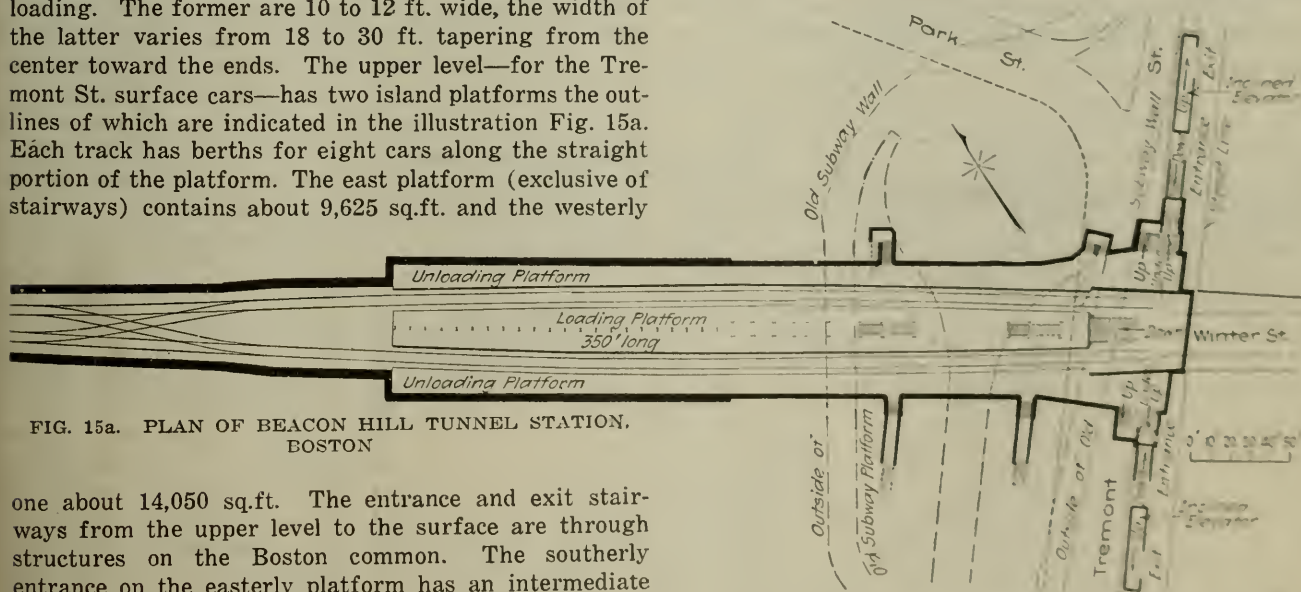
PLAN OF BEACON HILL TUNNEL STATION, BOSTON
